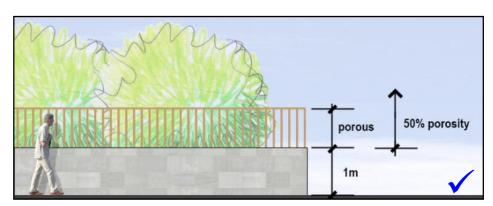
The fence wall with a minimum of 50% porosity is acceptable facing the pedestrian street
